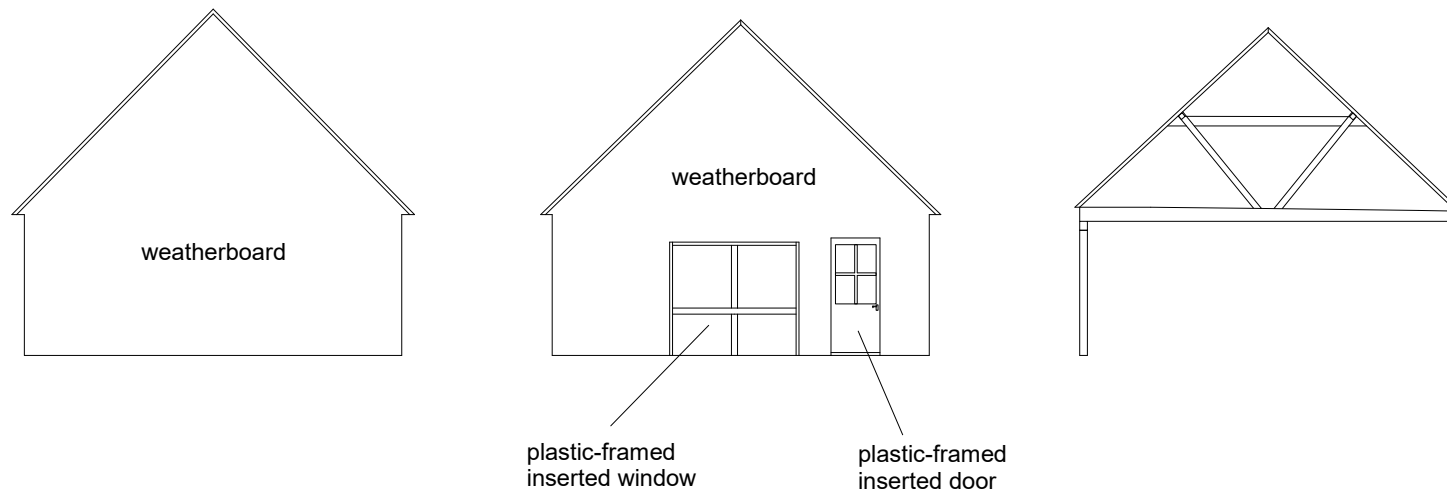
Building B southern (left) and northern (centre) elevations and truss cross-section (right).
